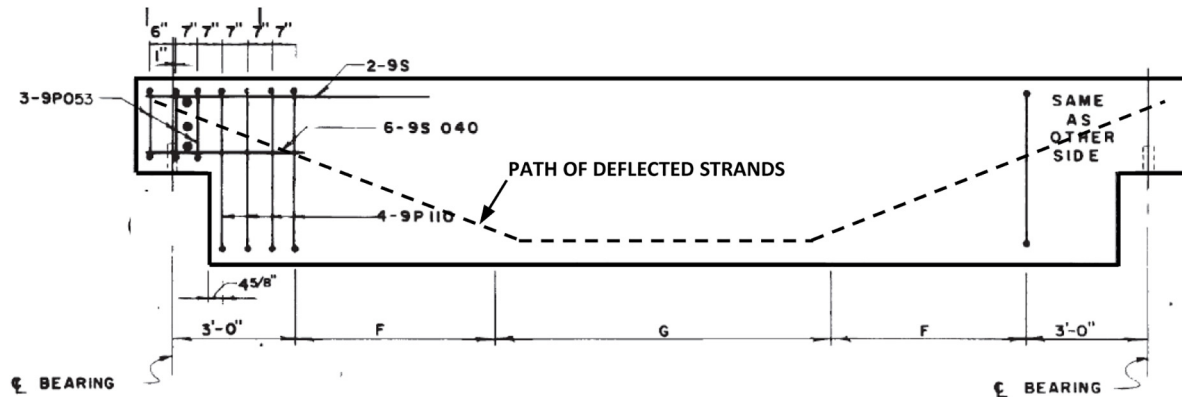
| Reinforcing details at dapped end and prestressing strand path of drop-in girder.
